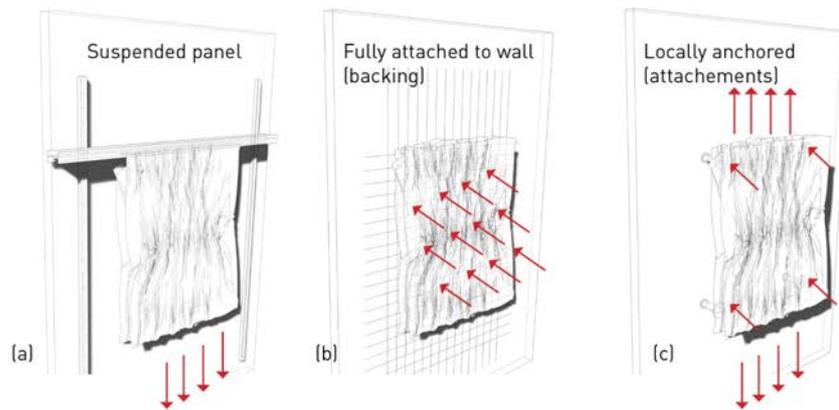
schematic anchoring types of façade tiles (a) suspension (b) backing (c) point fixtures
